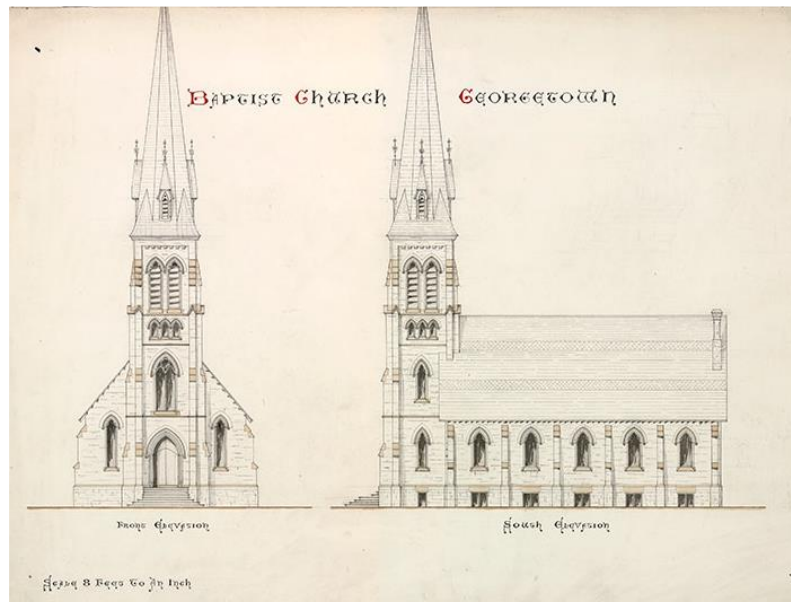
Langley, Henry. Baptist Church Georgetown. Architectural Drawing.
